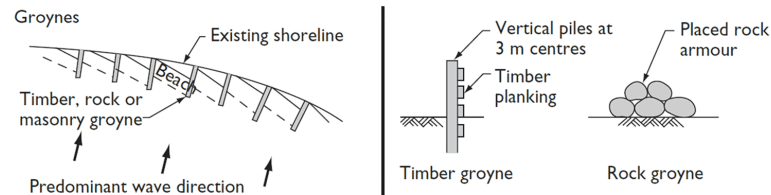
Typical plan view and cross section illustrating a pile and rock armour groyne system.
